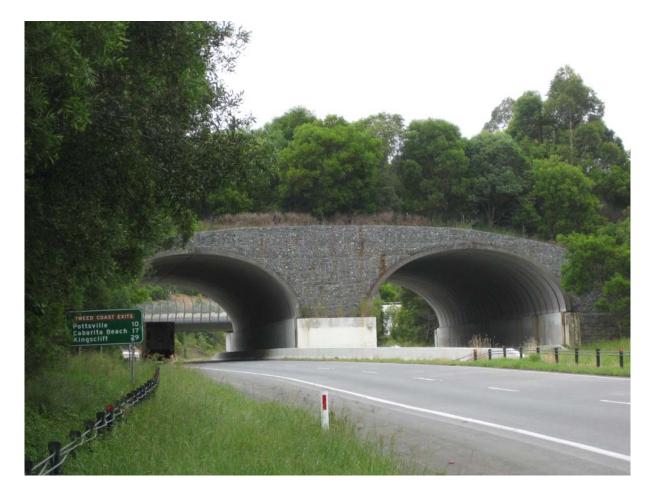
Existing fauna bridge on the Yelgun to Chinderah upgrade section of the Pacific Highway
